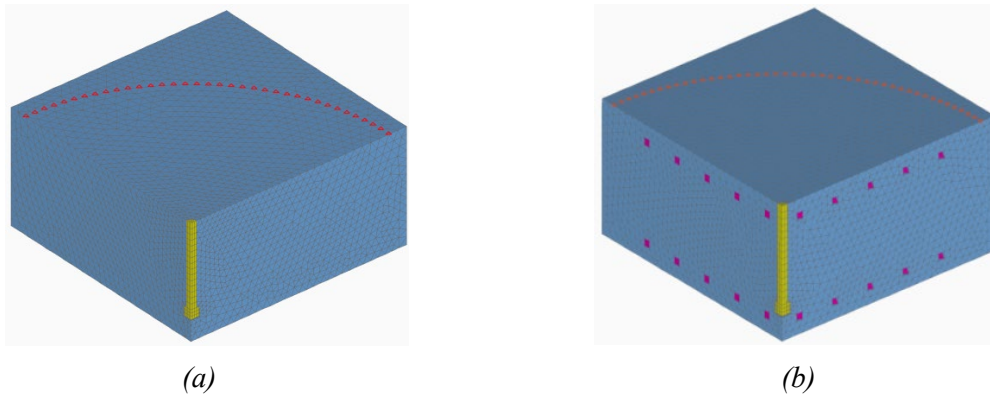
Typical discretized 3D FE models for anchors cast in: (a) unreinforced concrete, and (b) reinforced concrete.
